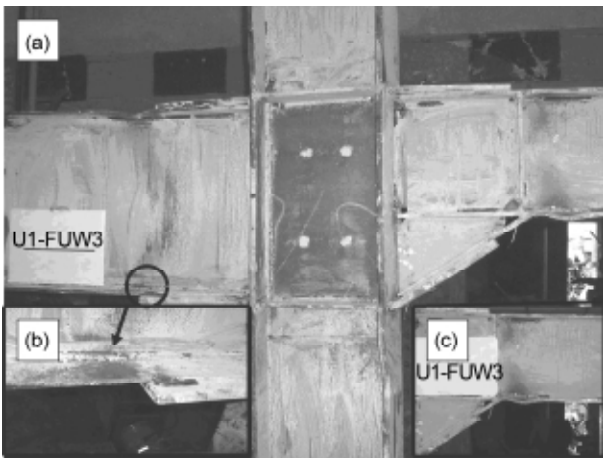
(a) Test specimen U1-FUW3 and flaking of whitewashed area after the test (rear view) (b) deep beam bottom flange without any rupture (rear view) (c) flaking of whitewashed area at shallow beam with haunch connection system.
